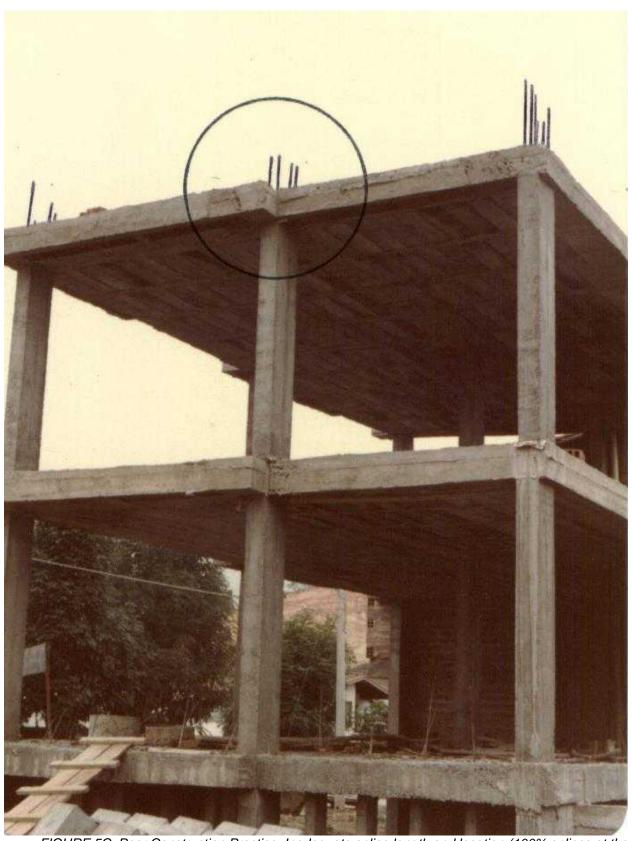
C: Poor Construction Practice: Inadequate splice length and location (100% splices at the column base)
